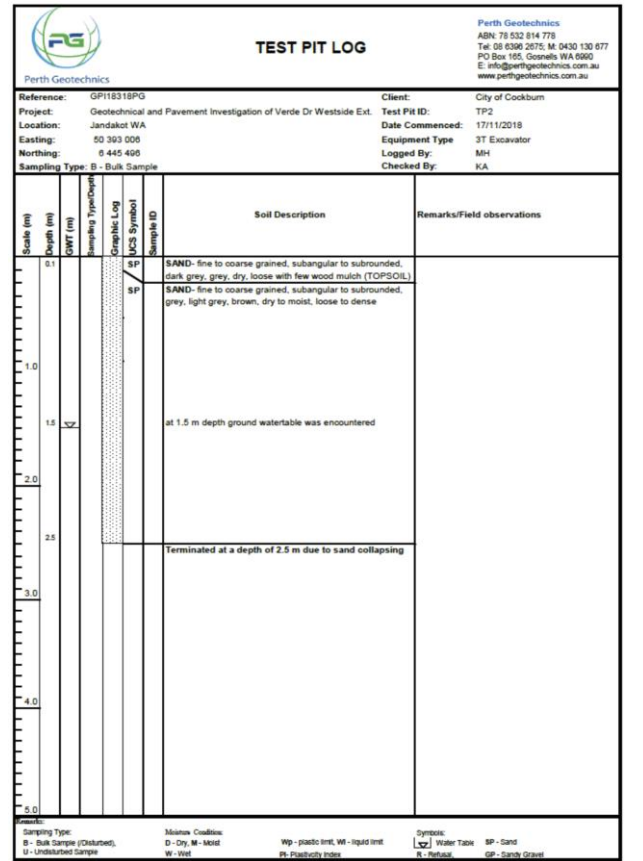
Test Pit Log (Verde Dr.) at Location TP2
